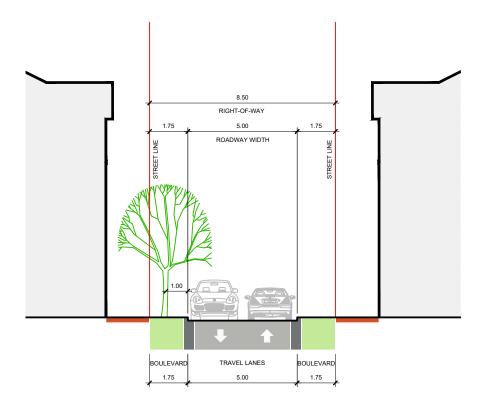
D-D' Proposed Private Lane Cross Section
